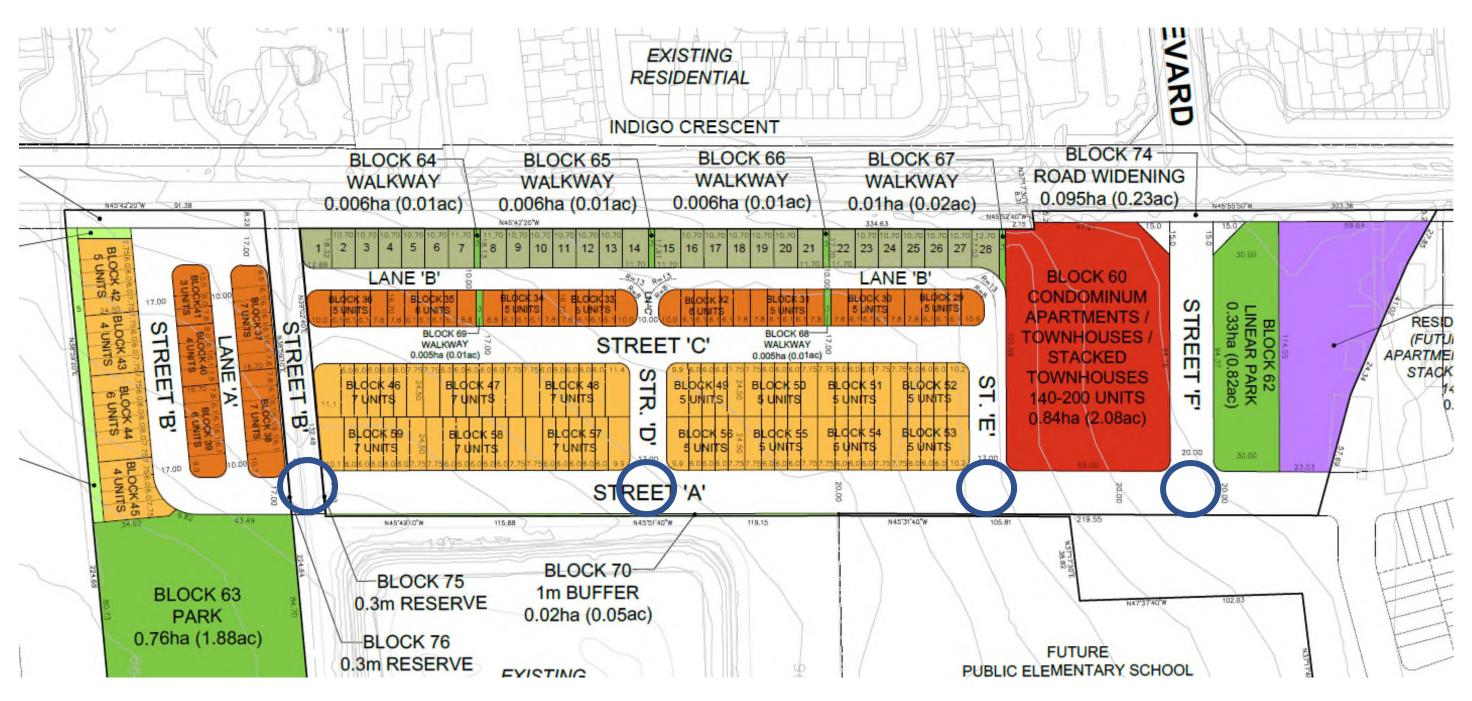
PROPOSED ON-STREET PARKING OPPORTUNITIES
